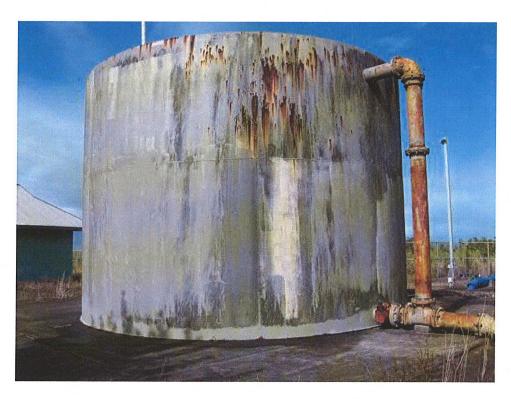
Hamakuapoko Well No. 1 Storage Tank (Northwest View)
